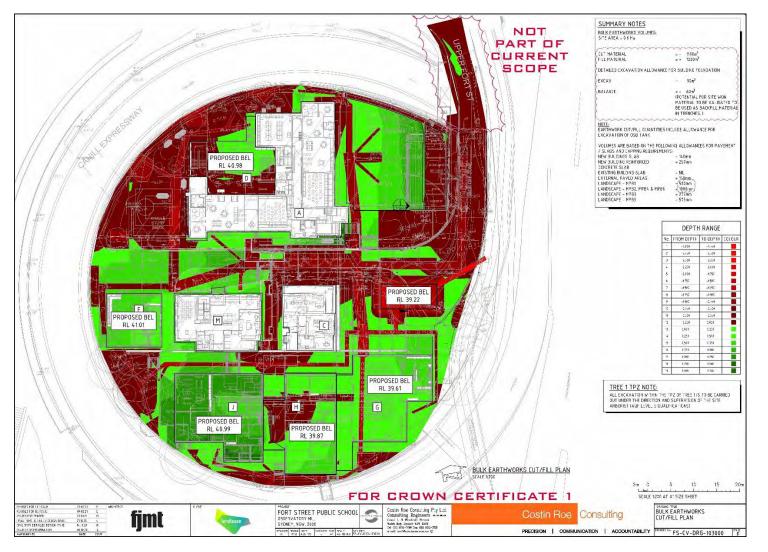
Bulk Earthworks cut and fill plan. (Source: Lendlease, 2021)
